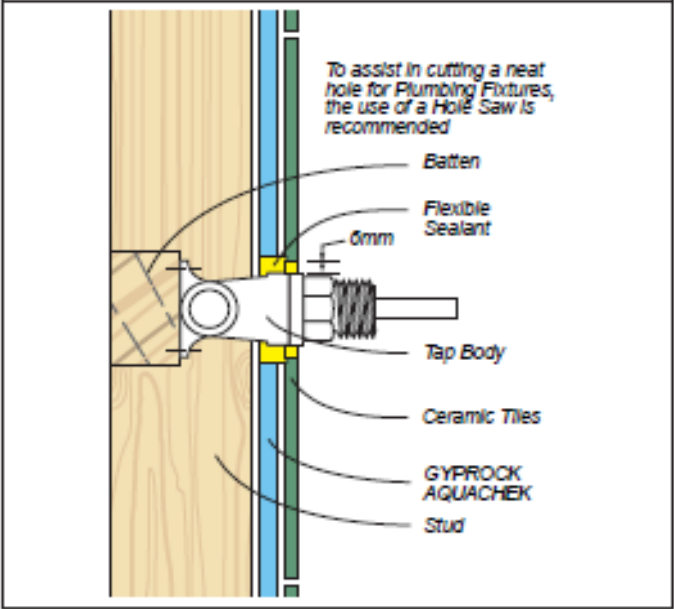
LAUNDRY TUB/SINK INSTALLATION
